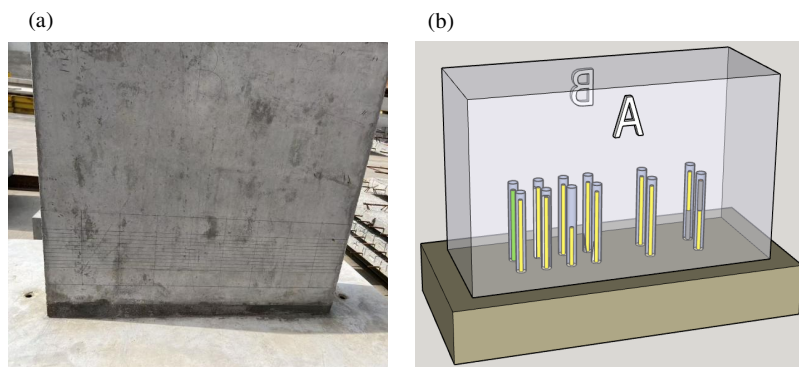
(a) Prefabricated concrete wall (b) Internal spatial distribution diagram of prefabricated concrete wall.
